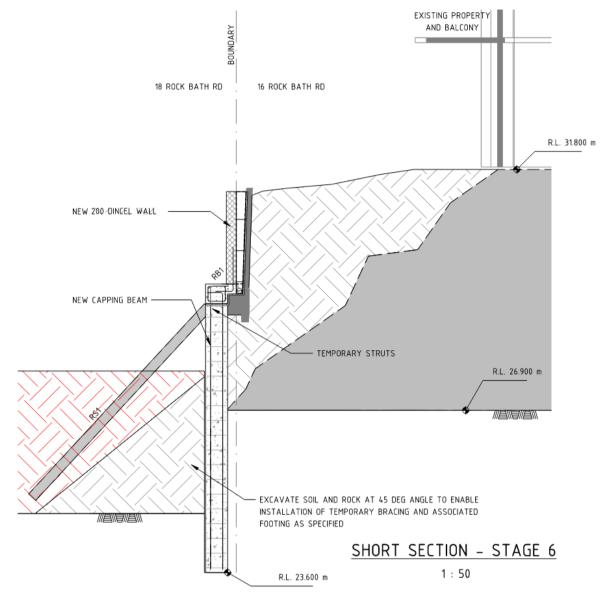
Proposed typical section of proposed retaining design showing Dincel wall in front of existing masonry retaining wall with gravel backfill, and required capping beam and piling structure to provide support for Dincel wall.
